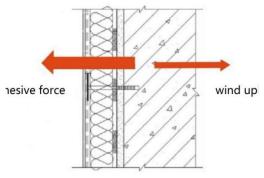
Force Analysis Diagram of Rock Wool Board Thin - Plaster Exterior Wall External Insulation System.
